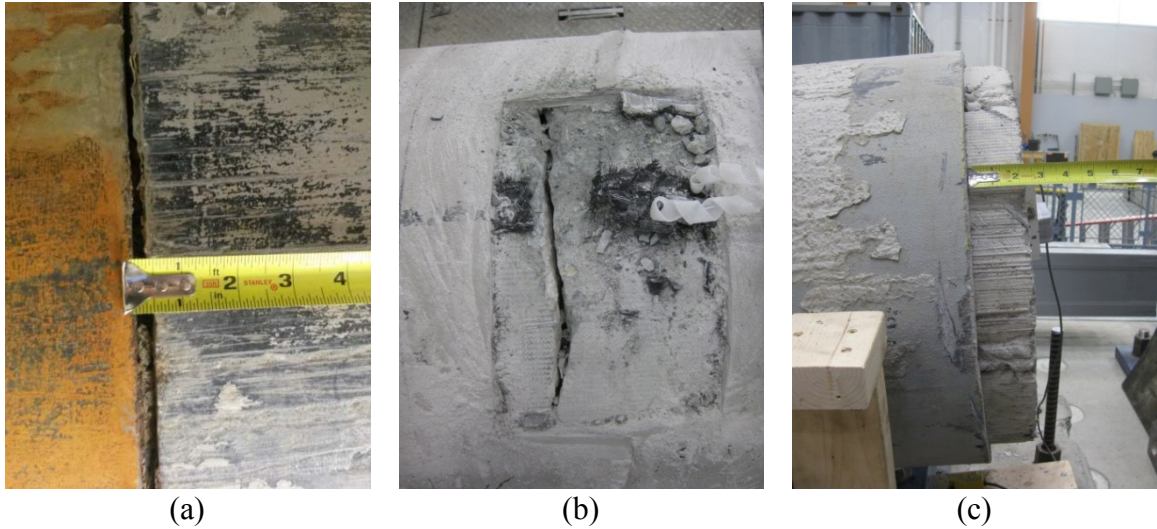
Concrete Movement in Pile A (a), Internal Cracking in Pile A (b), and Concrete Movement in Pile C after Loss of Composite Action (c)
